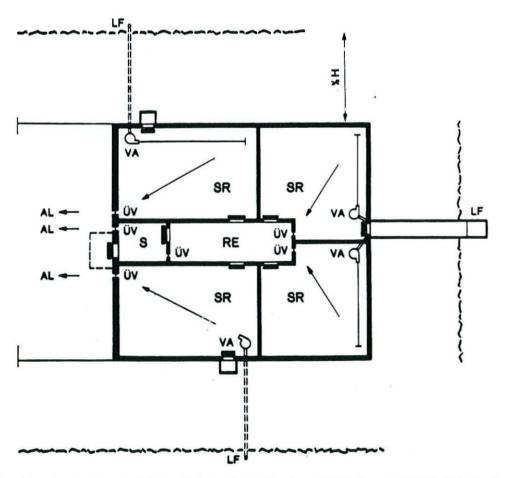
The arrangement of the ventilating equipment in a four-celled shelter group (151 to 200 places).
